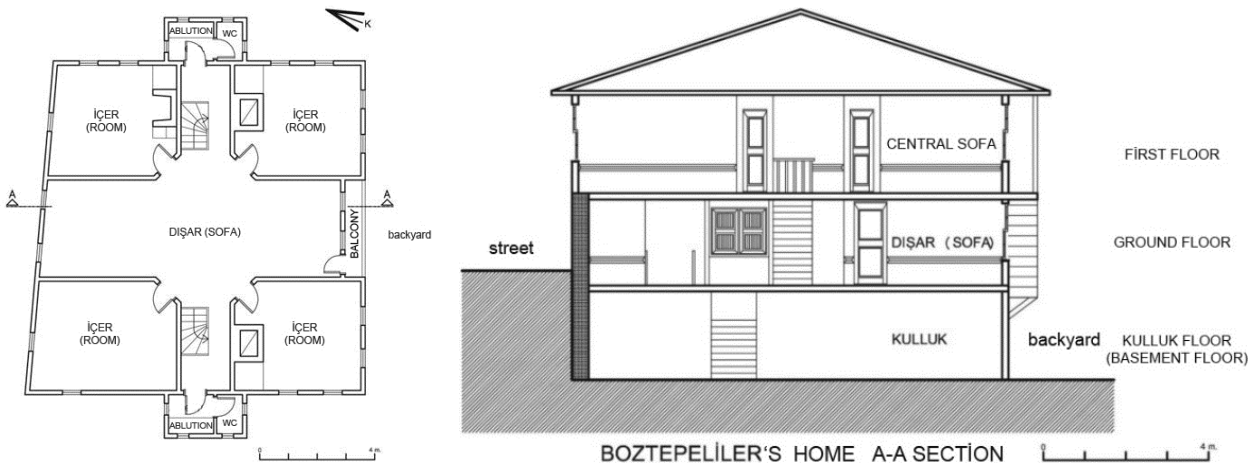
Plan With Central Sofa and Section Example (Erarslan&Dağ, n.d.)
